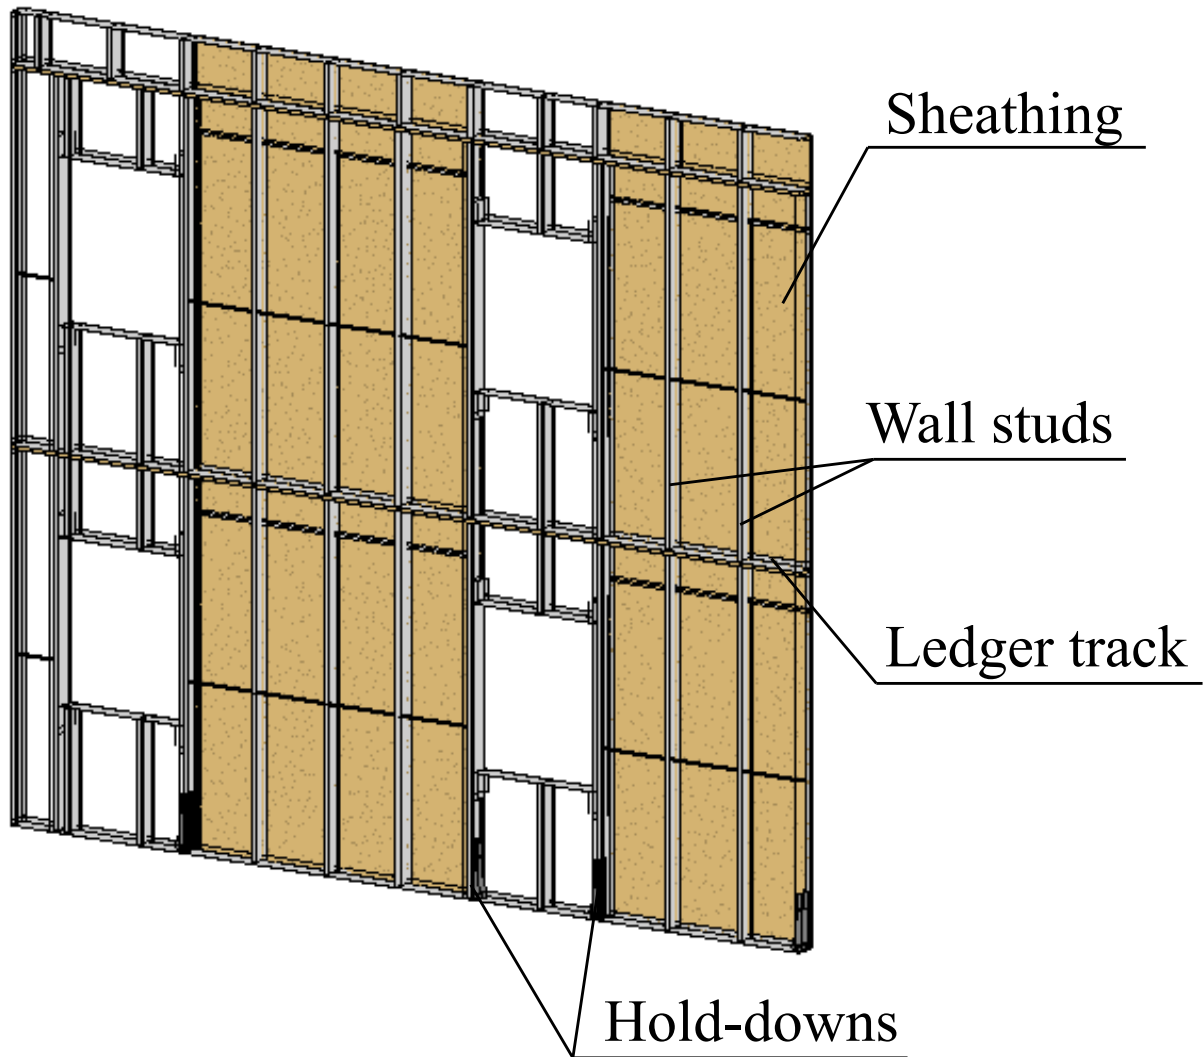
Shear wall subsystem and its essential components [61, 78]
